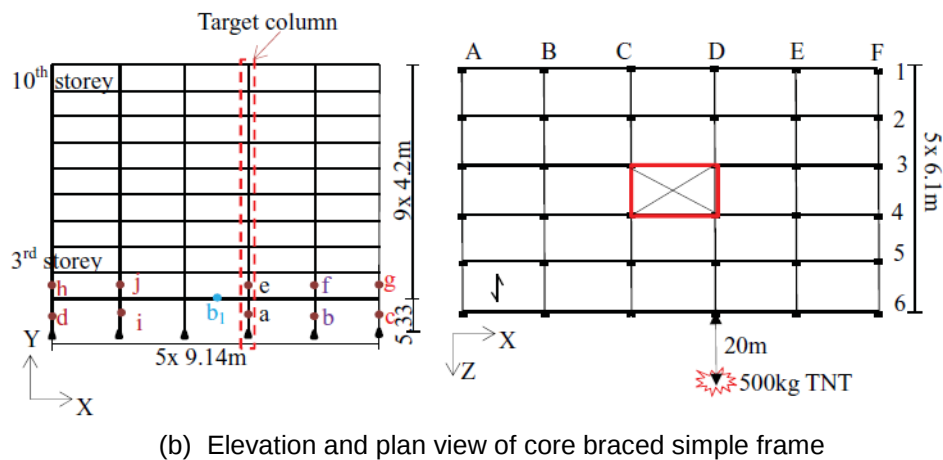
Elevation and plan view of ten-storey building (secondary beams are not shown)
